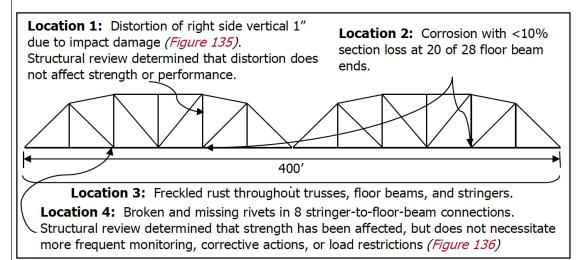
Elevation view of a truss bridge showing superstructure defect locations.
